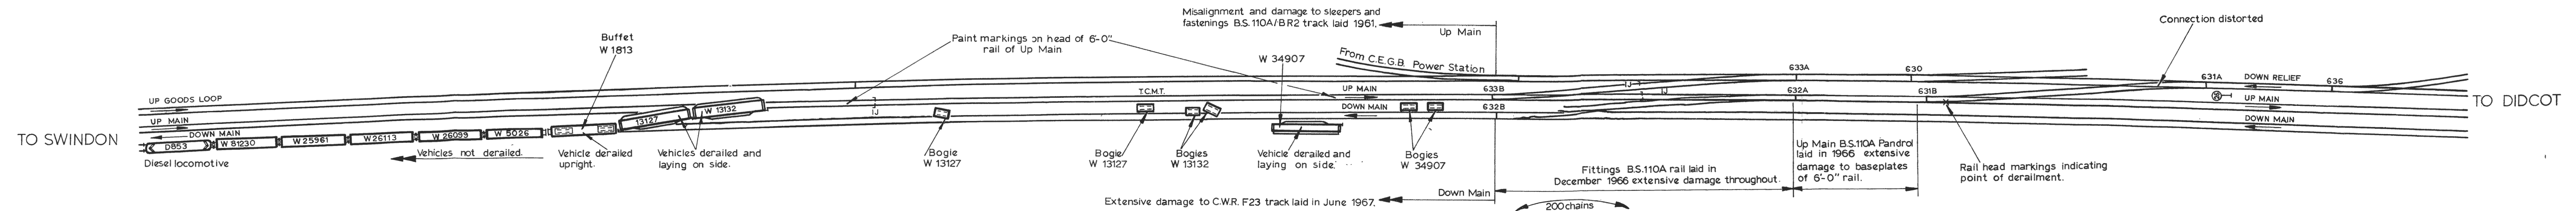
FIG. II. SITE PLAN SHOWING INITIAL POINT OF DERAILMENT, POSITION WHICH TRAIN CAME TO REST, AND DETAILS OF DAMAGE TO TRACK
